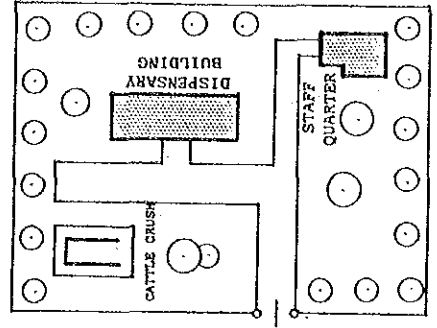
PROPOSED SITE PLAN OF LIVESTOCK DEVELOPMENT STATION
